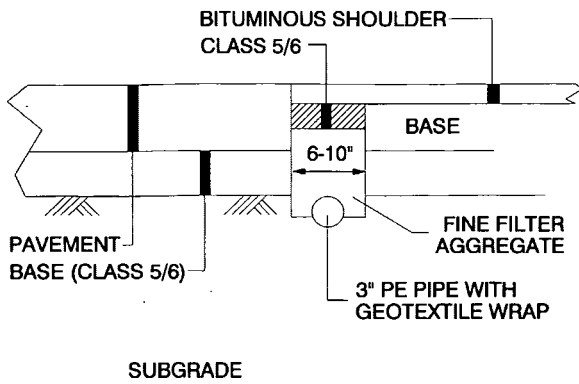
Typical drain section for Mn/DOT subsurface pavement edge drains.
